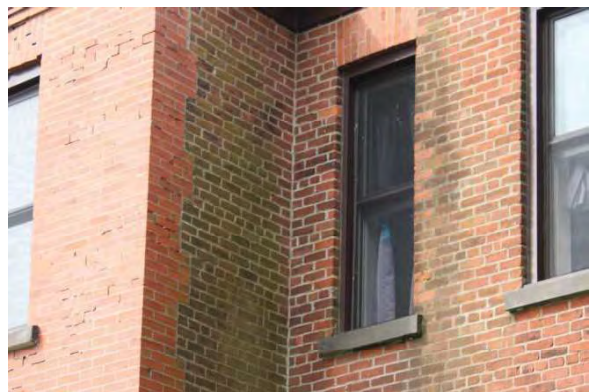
Seam between front portion of east façade and east façade of rear wing, looking southwest
